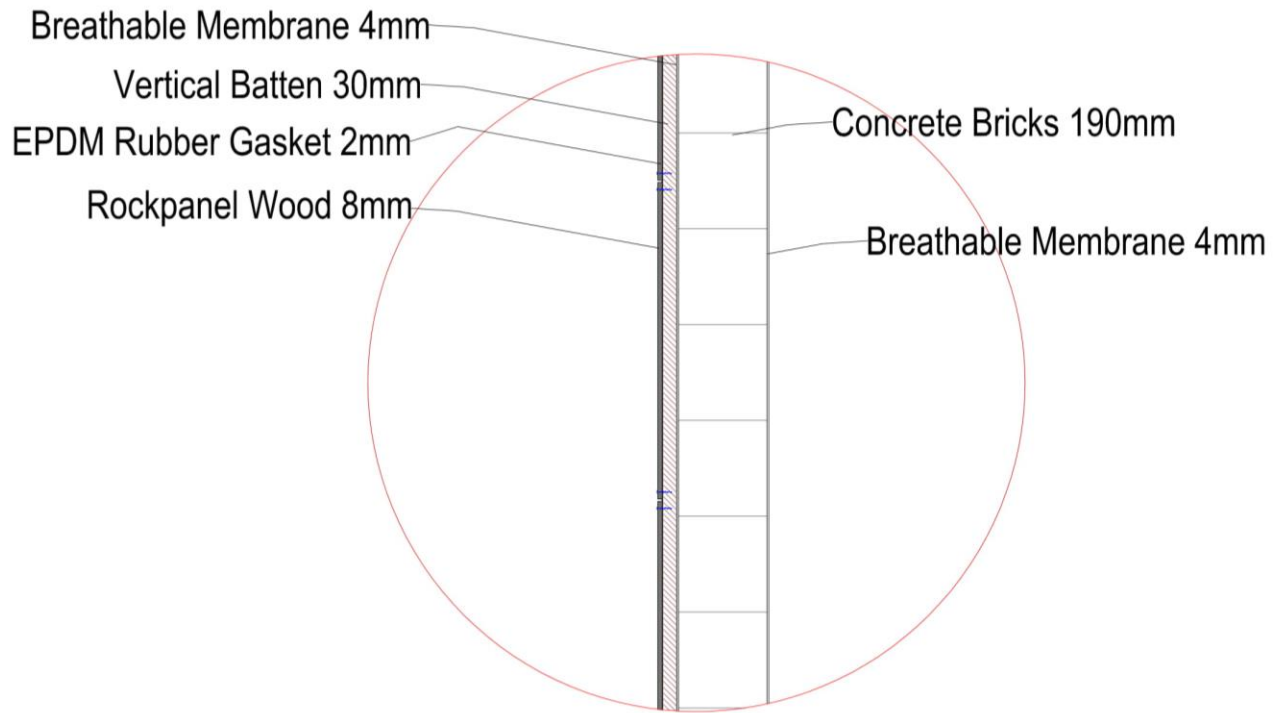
External Opaque Wall Vertical Section Detail
